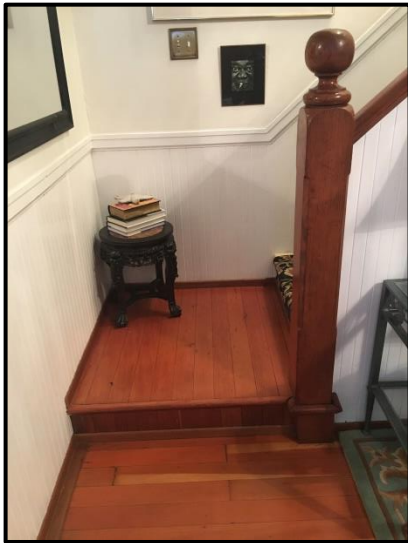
original wood floor and newel post. Notice original beadboard wainscoting.
